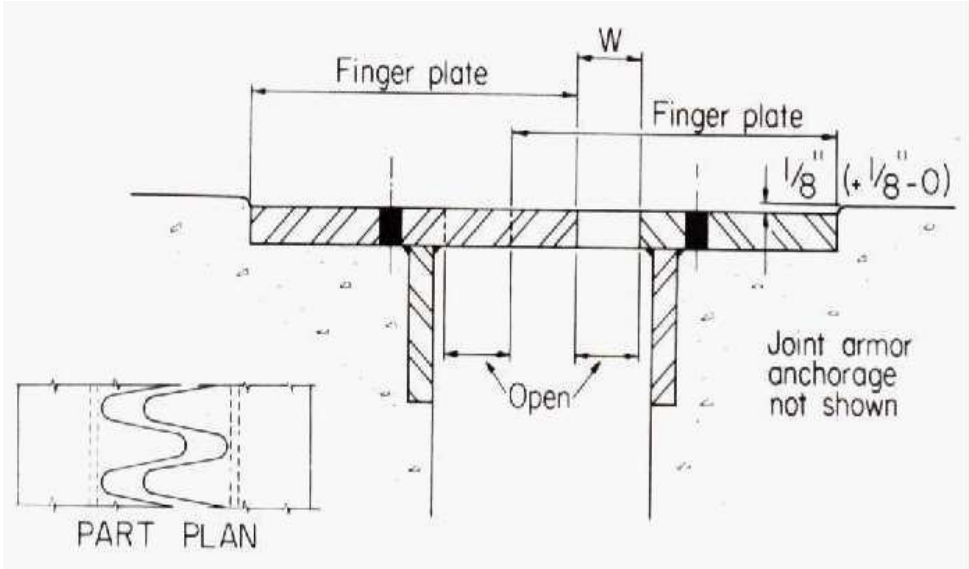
Cross Section of a Cantilever Finger Plate Joint
